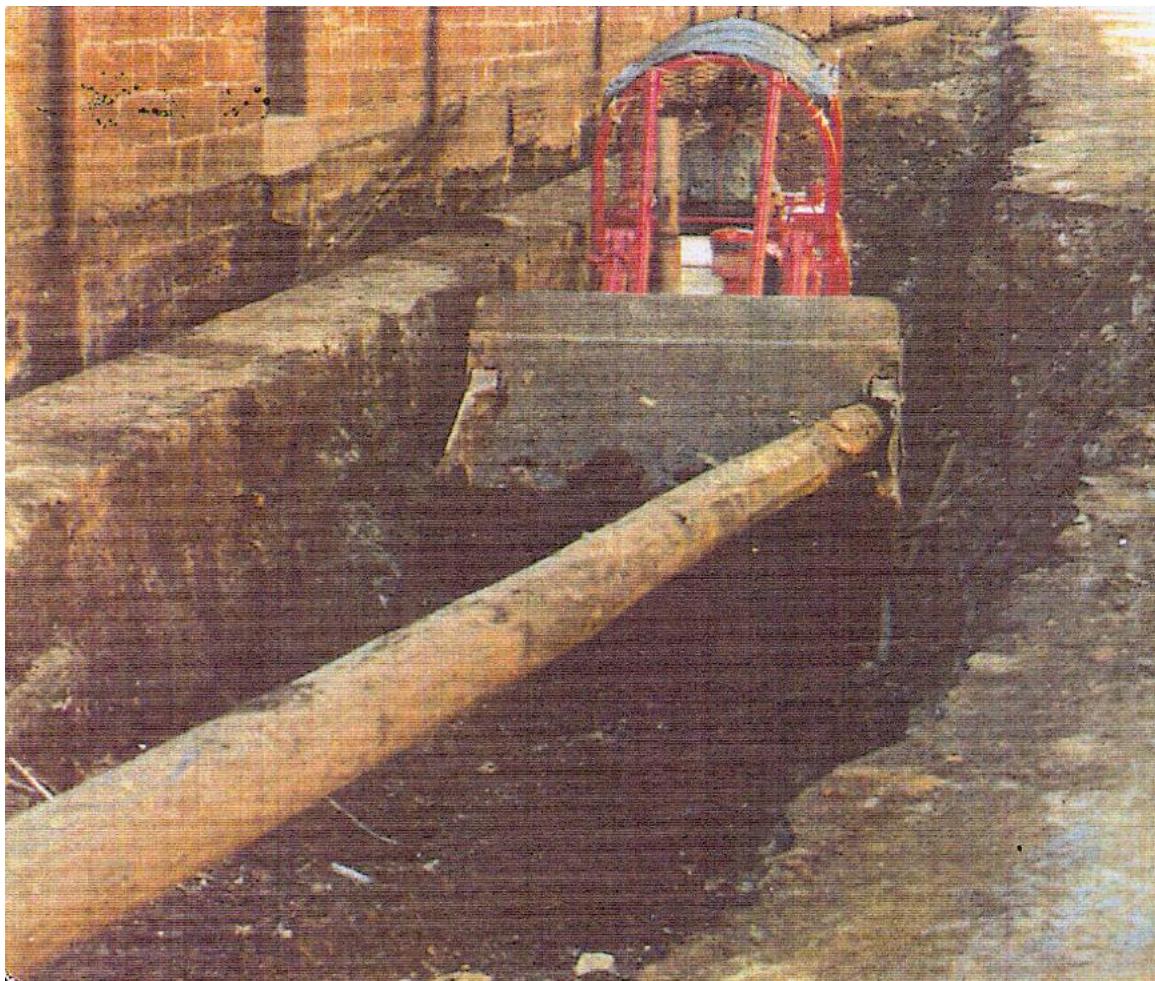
The concrete retaining wall about 800mm from the west wall of the building, in 1977.
